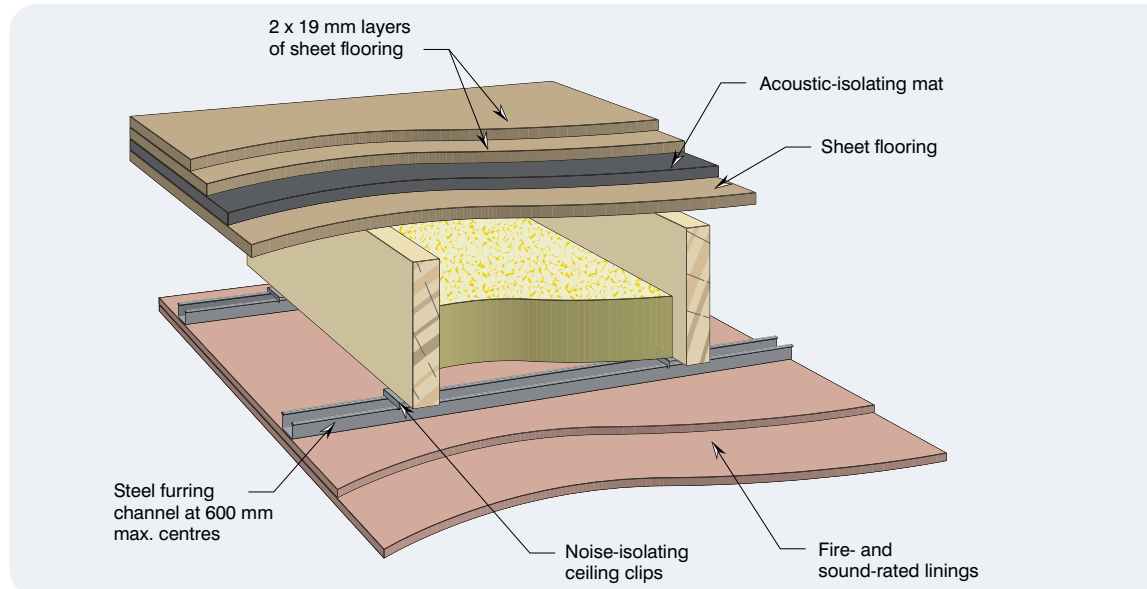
Adding mass to floor system through the use of additional floor sheets.
